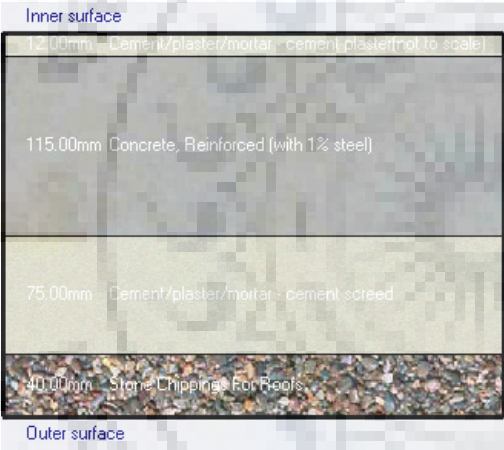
Stone Chipping Suspended Semi Exposed Floors
